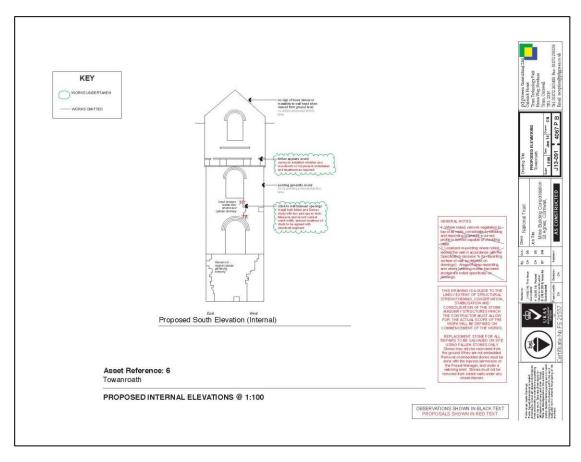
Southern internal elevation of Towanroath pumping engine house.
